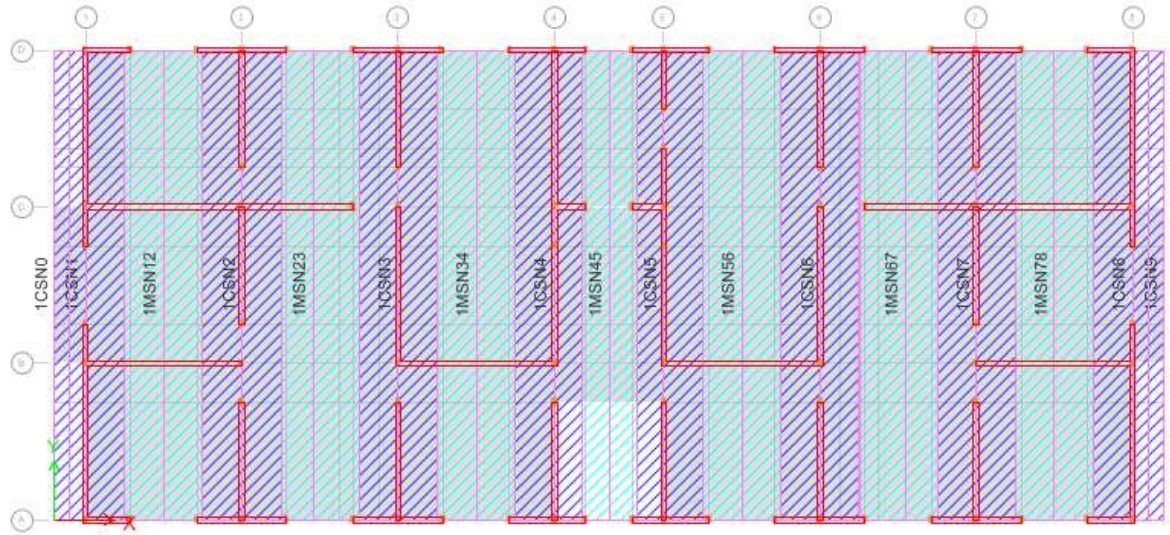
Plan of the slab with the strips. Layer B. 1st floor
